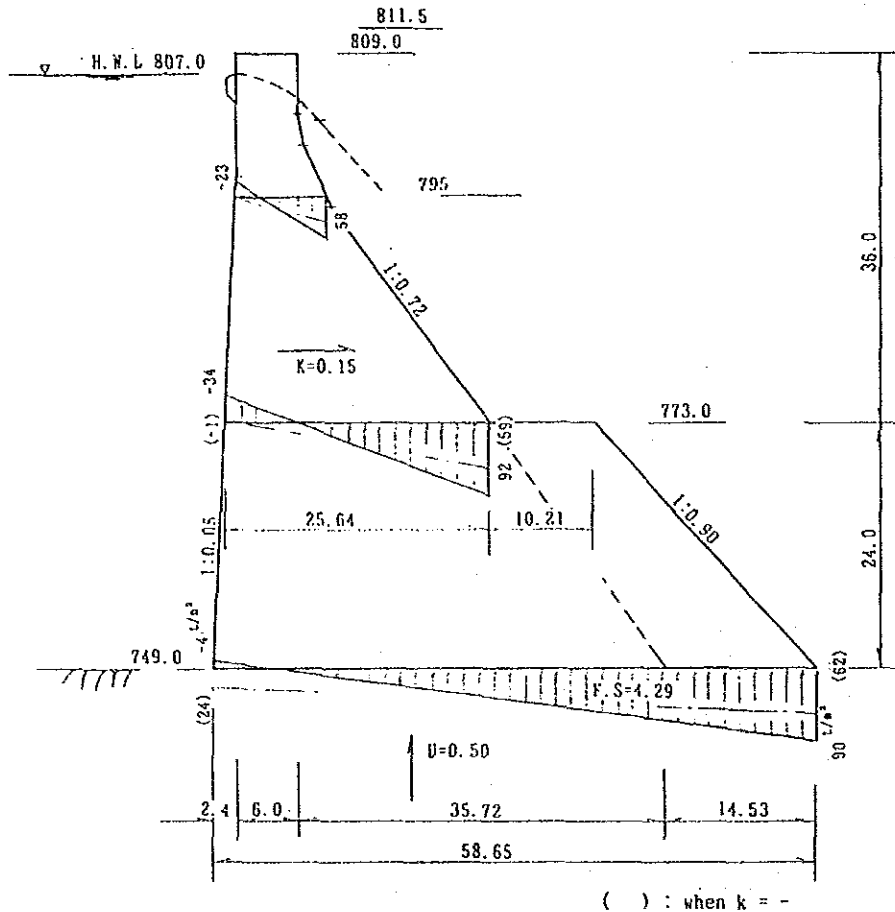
Stability Calculation Placing Concrete up to EL 773m
